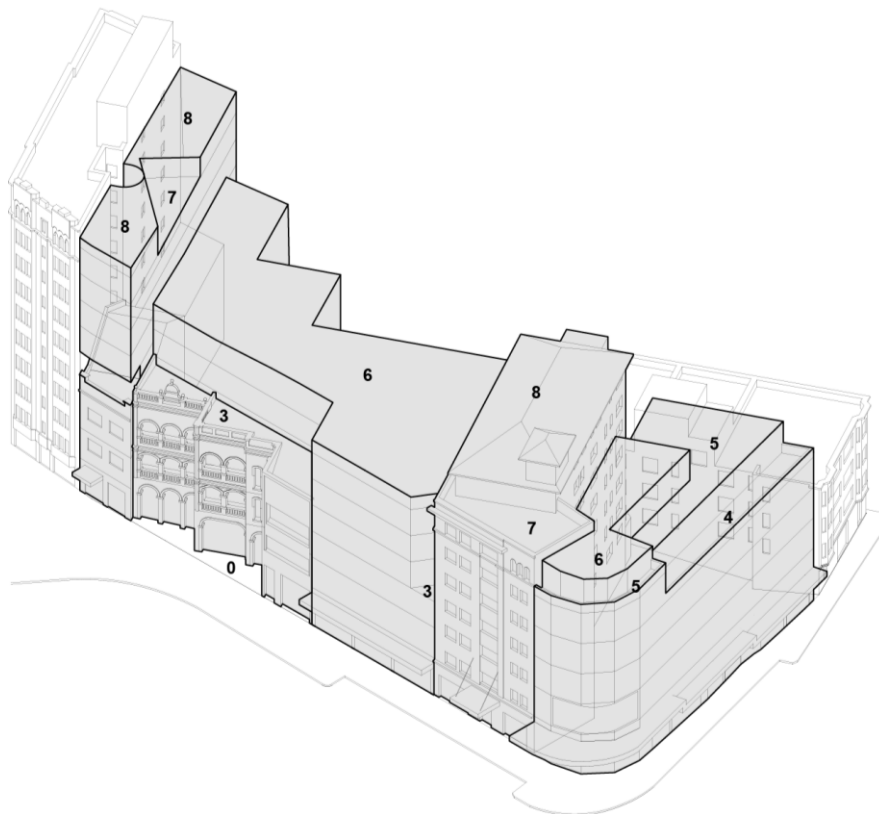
Indicative axonometric of the building heights and setbacks plan (viewed from the west)
